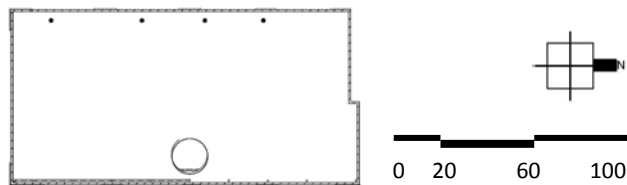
Roof Plan. Alley Poyner Macchietto Architecture, 2014.
